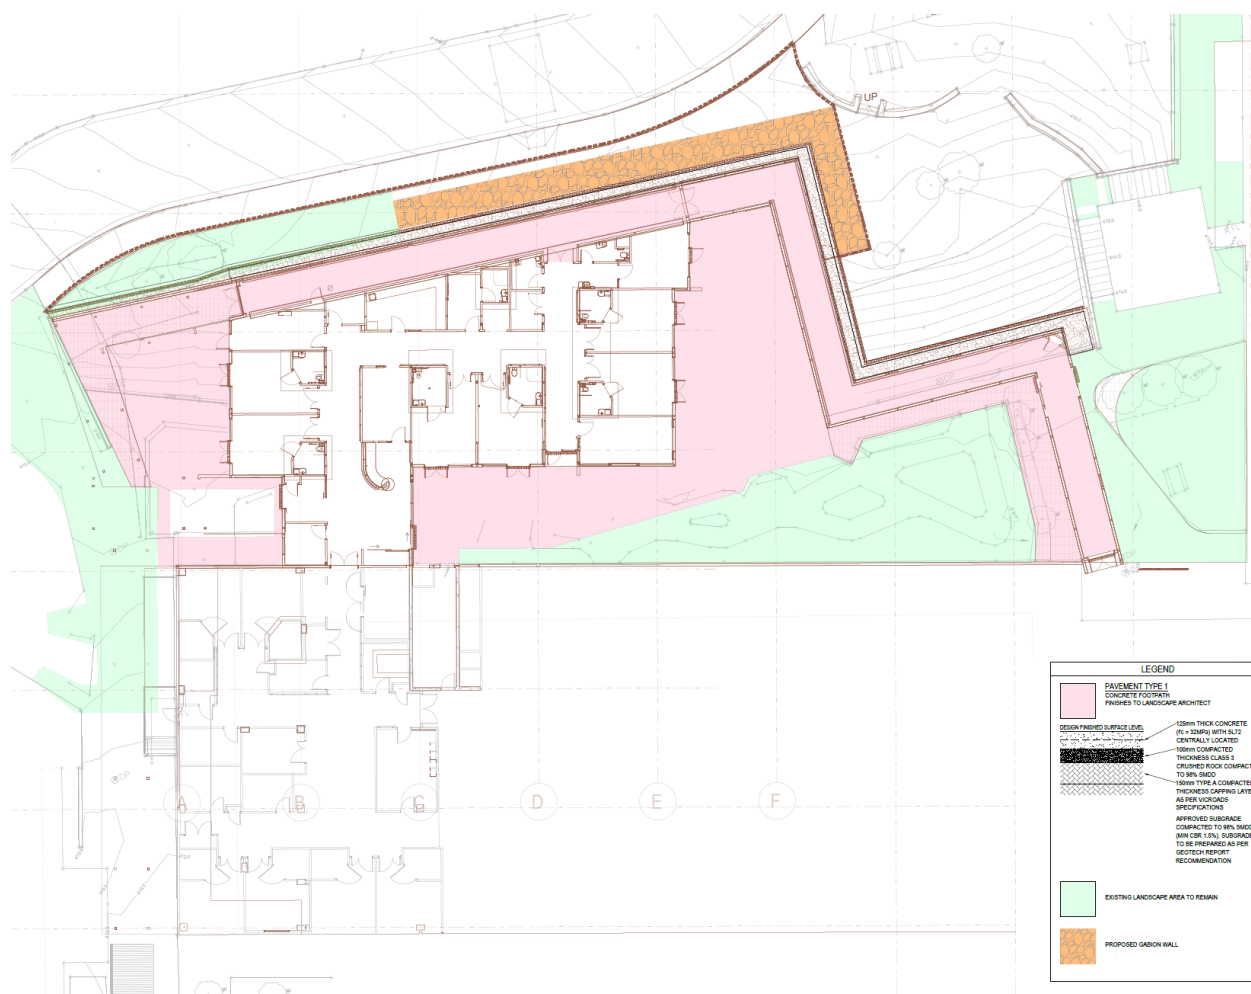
Proposed paving plan, including retaining wall and gabion baskets (Acor)
